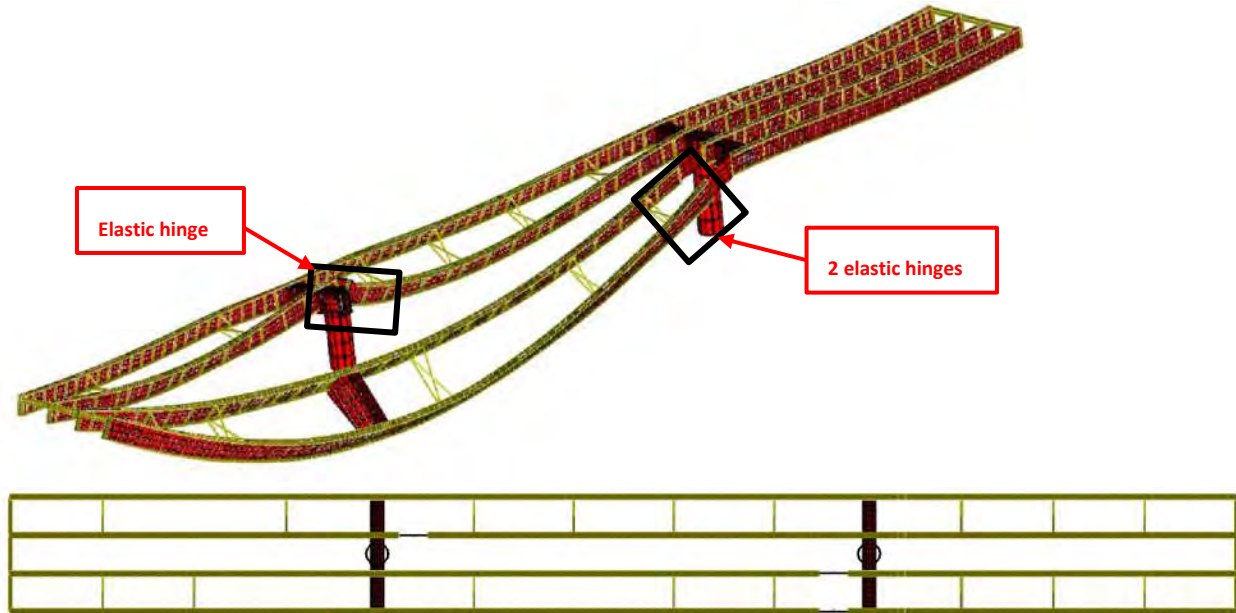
Framing Plan After Elastic Hinge in Girder C at 0.25xHL93
